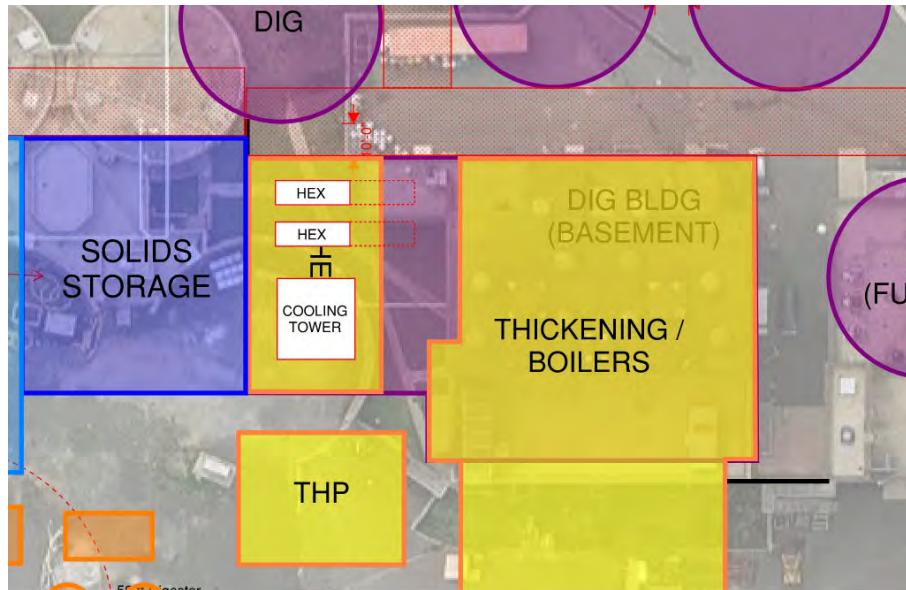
Evaporative Cooling Tower (Plume Abatement): Equipment Plan View—Decommission Dewatering Building Option
